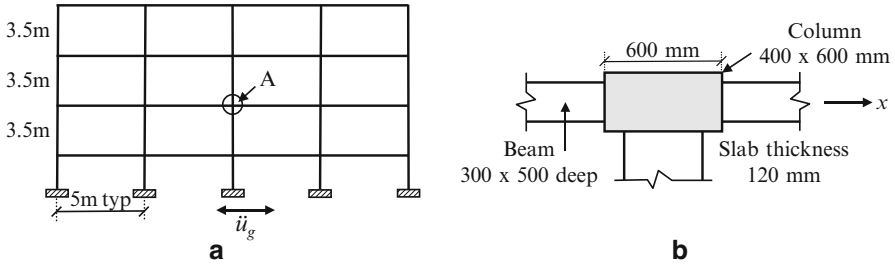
Frame joint design. (a) An SMRF. (b) Joint A (plan)
